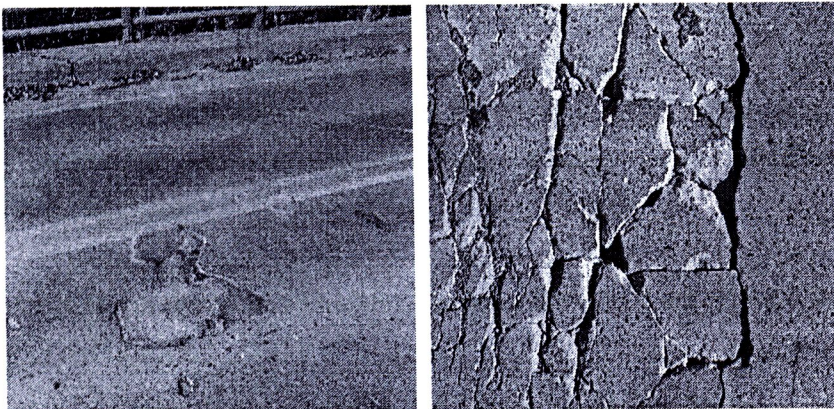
Typical cracking and potholes in concrete bridge deck
